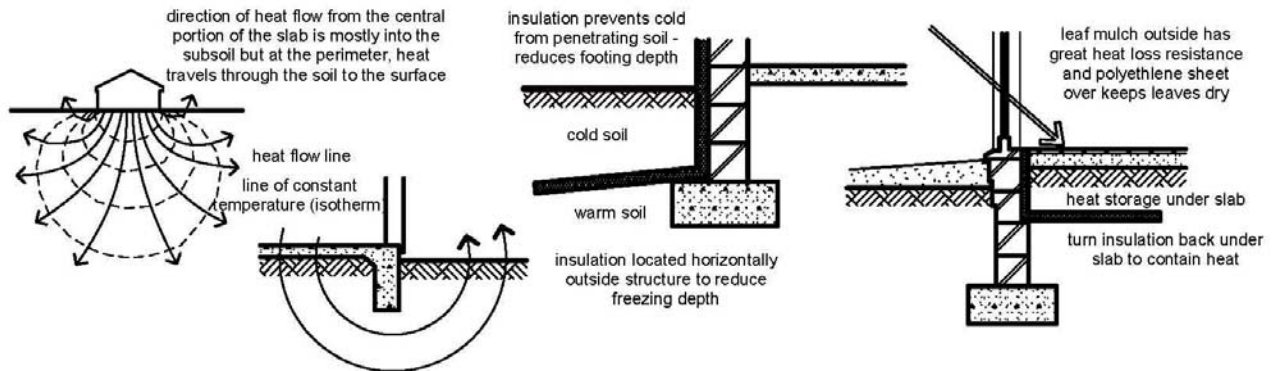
Earth slab insulation to prevent perimeter floor slab heat loss (after Watson and Labs 1983; pp 137-139)
